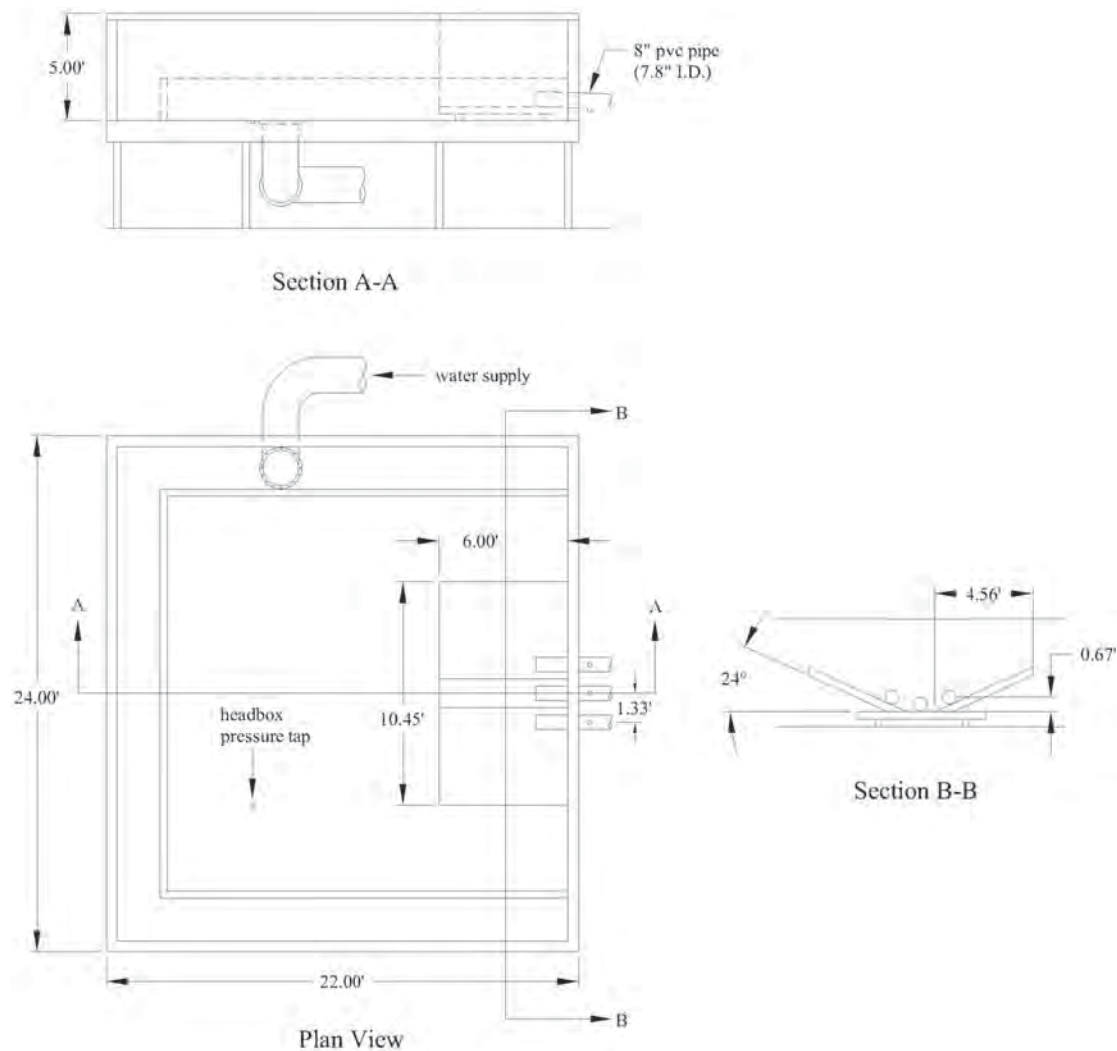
(A). Multibarrel culvert configuration with 2D horizontal barrel spacing and a trapezoidal approach channel.
